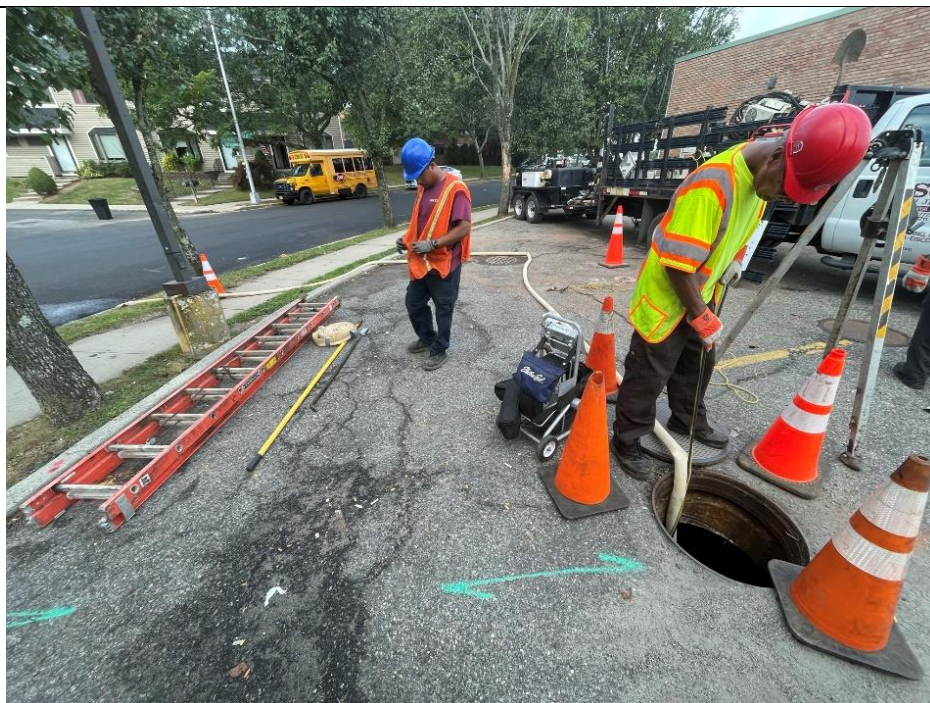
View of dye test conducted tracing the roof drains to the dry well, facing northwest.
